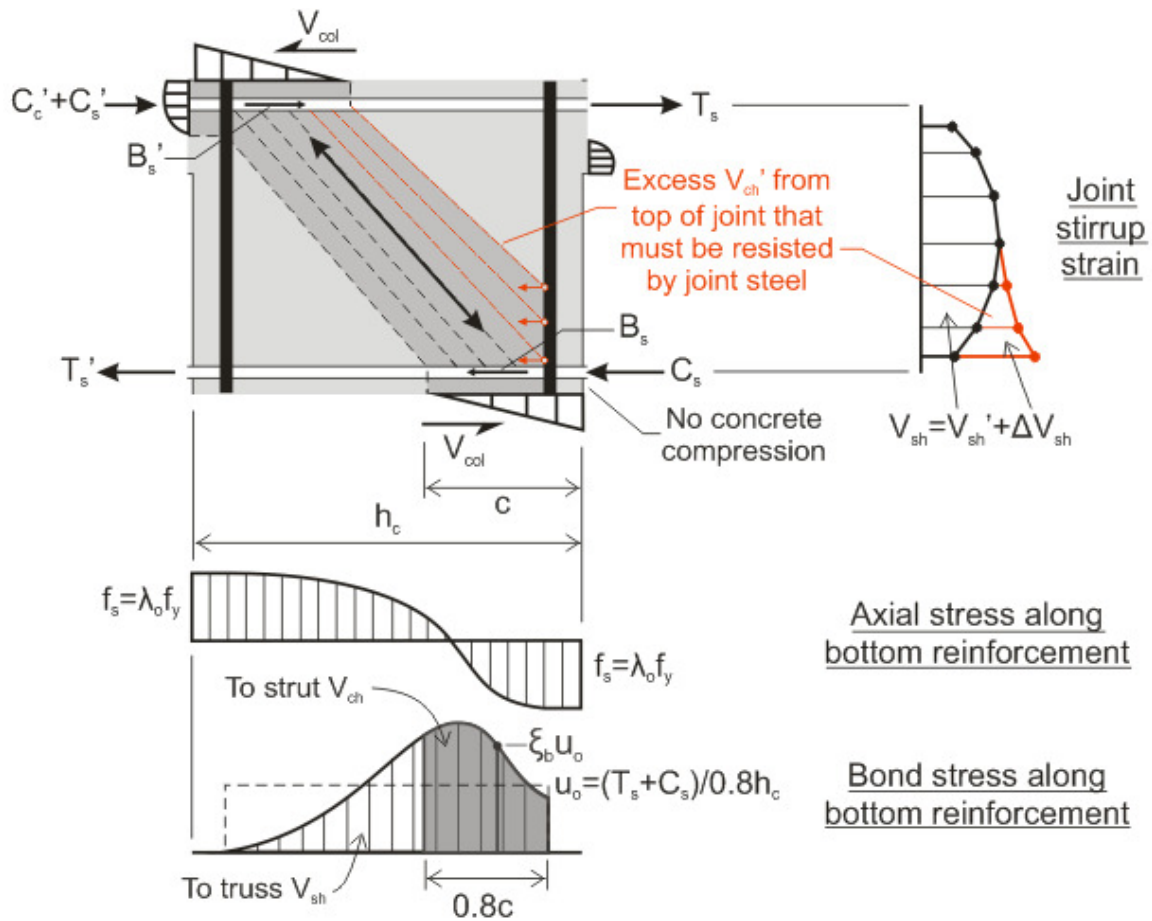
Concrete strut mechanism for interior joints with slotted-beams
